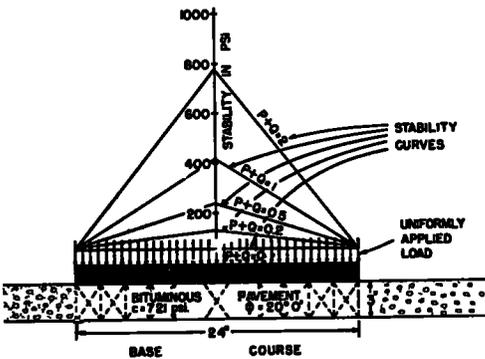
Relationships between applied load and stability of bituminous pavements at varying distances from edge under the loaded area for different degrees of frictional resistance developed between pavement and tire and between pavement and base (Pavement Stability less than Applied Load for Edge Conditions) Airplane Tire
